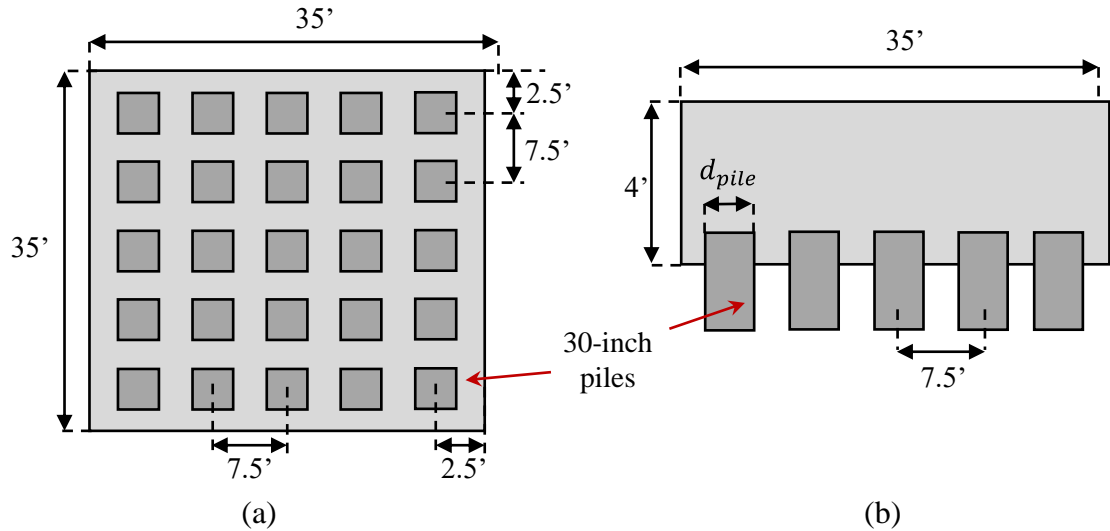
Pile cap details for 5x5 grid (a) Plan view (b) Cross section
